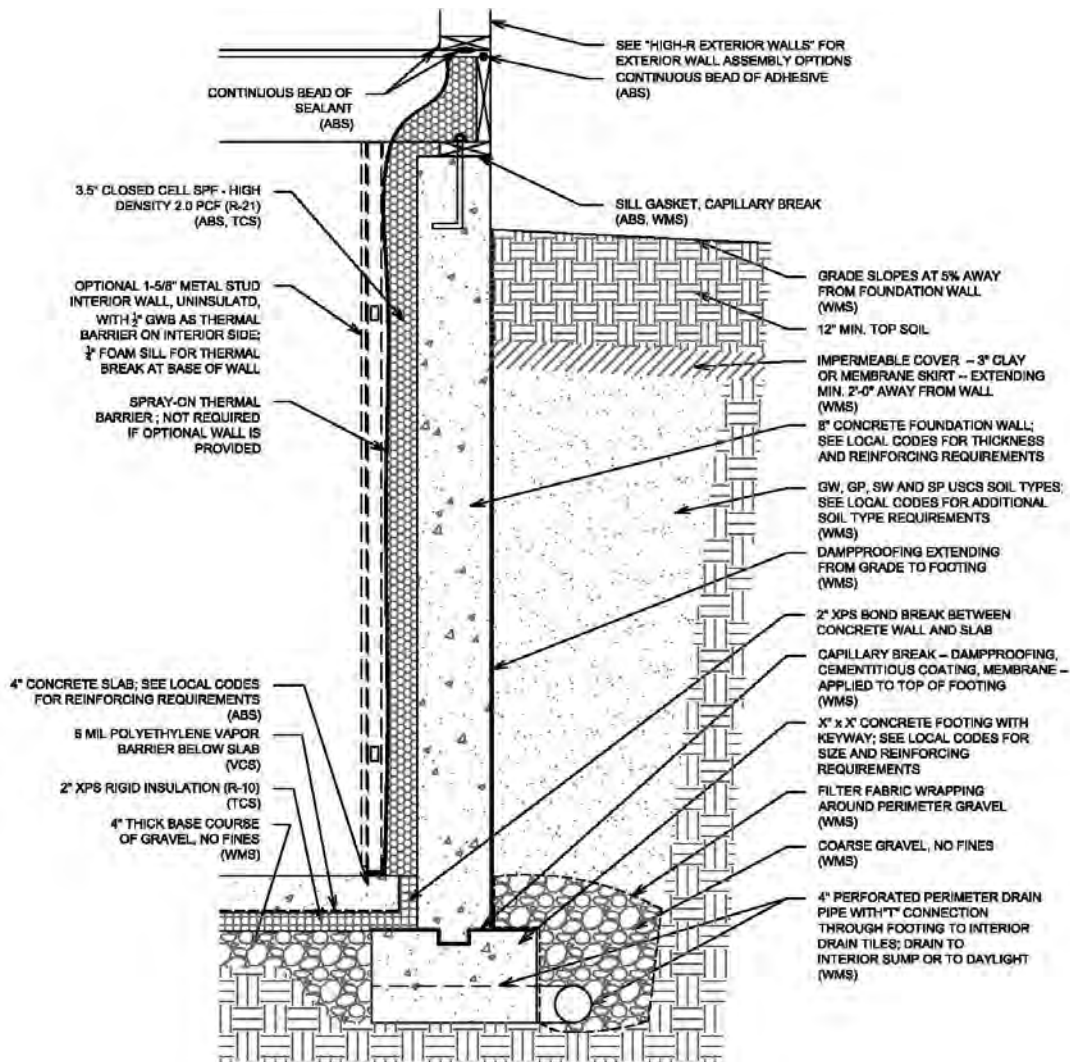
Case 6 Detailed Drawing – Recommended Foundation Wall System
